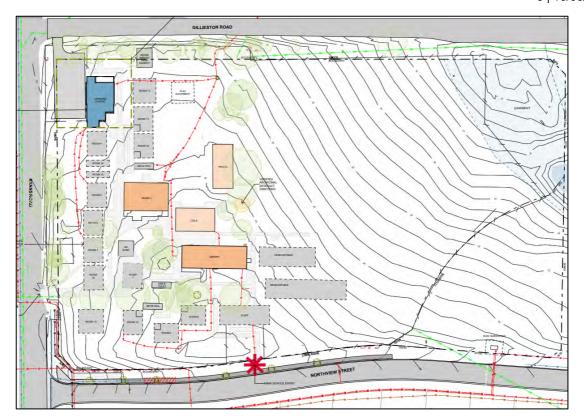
Existing Site Plan (Source: SHAC, 2024)
